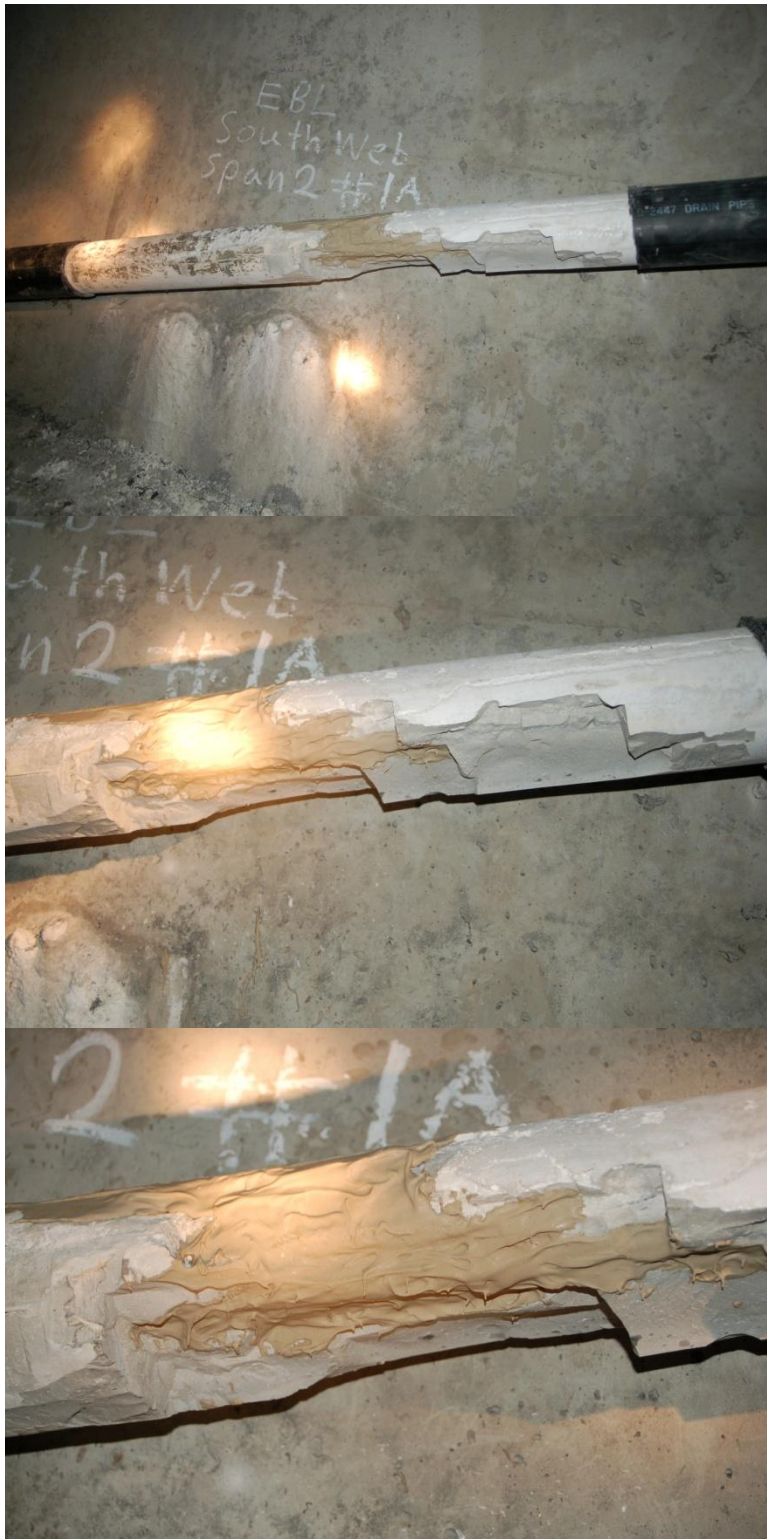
James B. Edwards Bridge: Grout Voids and Tendon Exposure in Ducts
